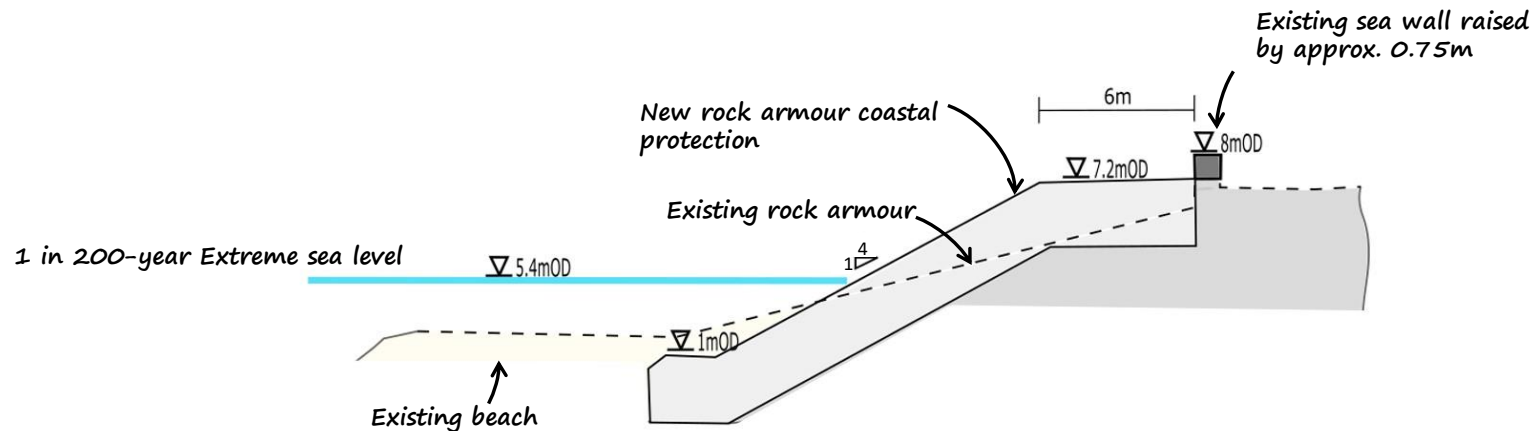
Cross section of improved rock armour and raised sea wall at Towyn Revetment
